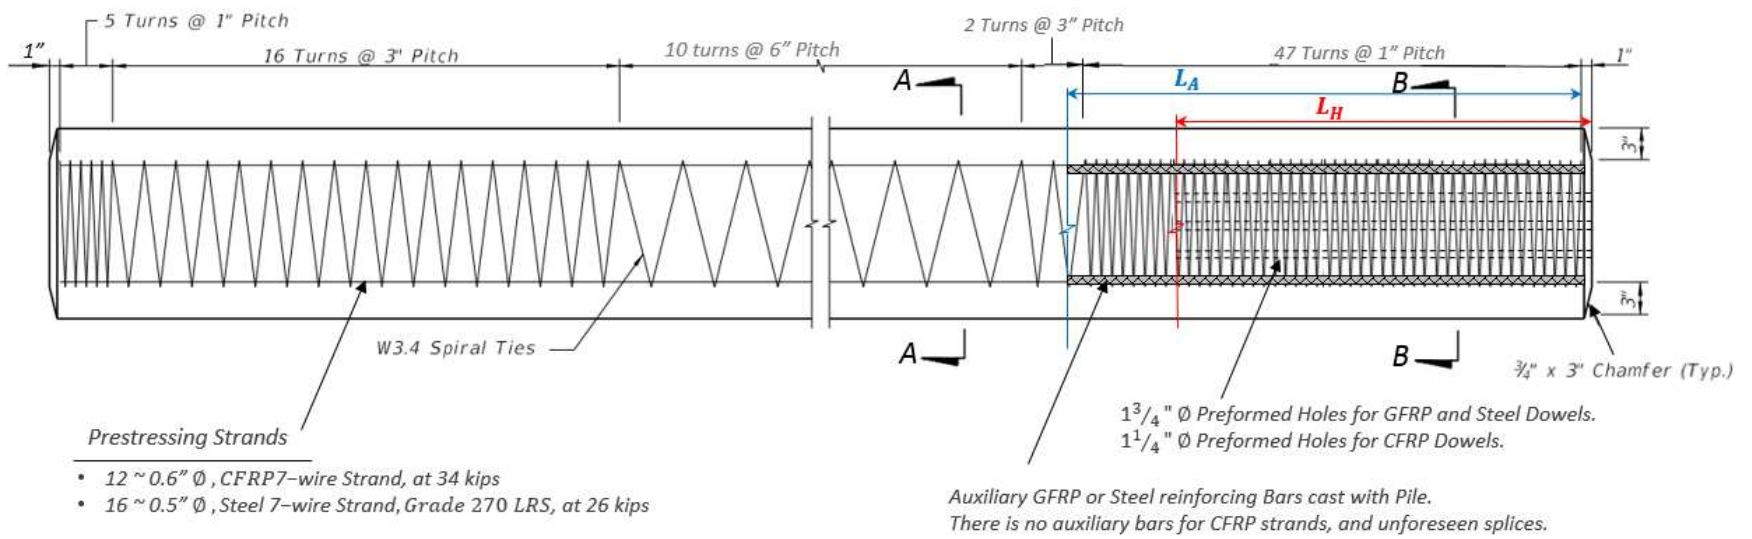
The elevation view of the female pile segment (Preplanned- Specimens 3 through 10)
